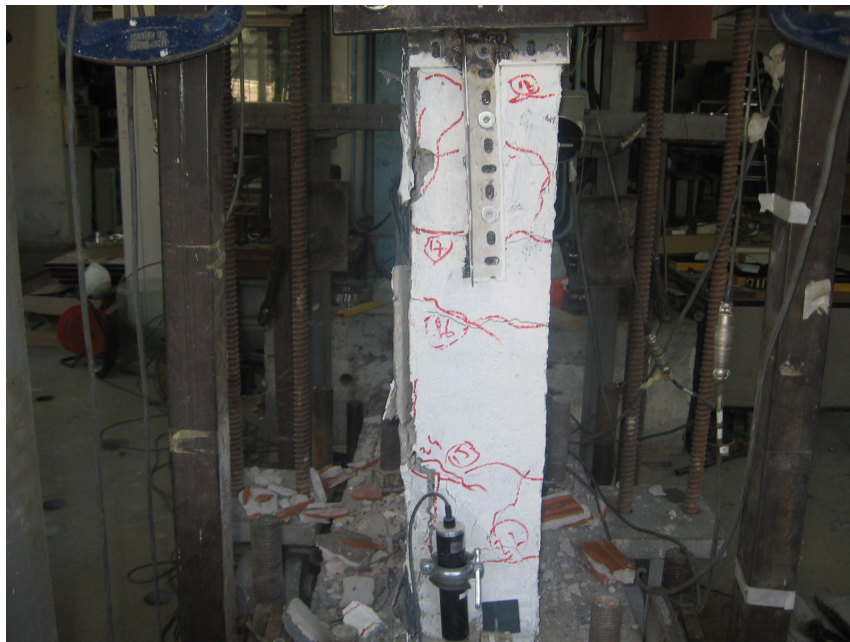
Tension cracks on left column of specimen O1
